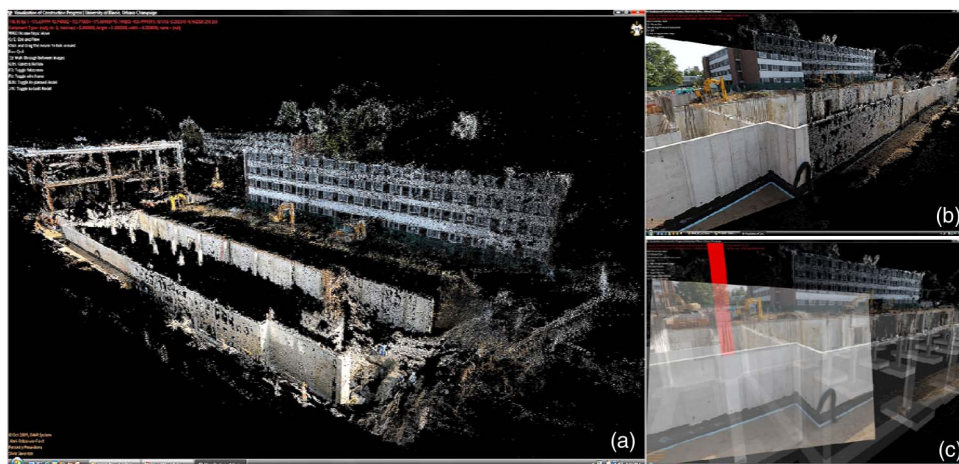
An example of a D⁴AR model generated with 160 photos (2 megapixels in quality) (reprinted with permission from Golparvar-Fard et al. 2010): (a) as-built cloud model collected along the site walk of the basement area; (b) one site photo rendered over the camera frustum visualized the construction site through joint 3D point cloud and image representation; (c) BIM superimposed with point cloud model
